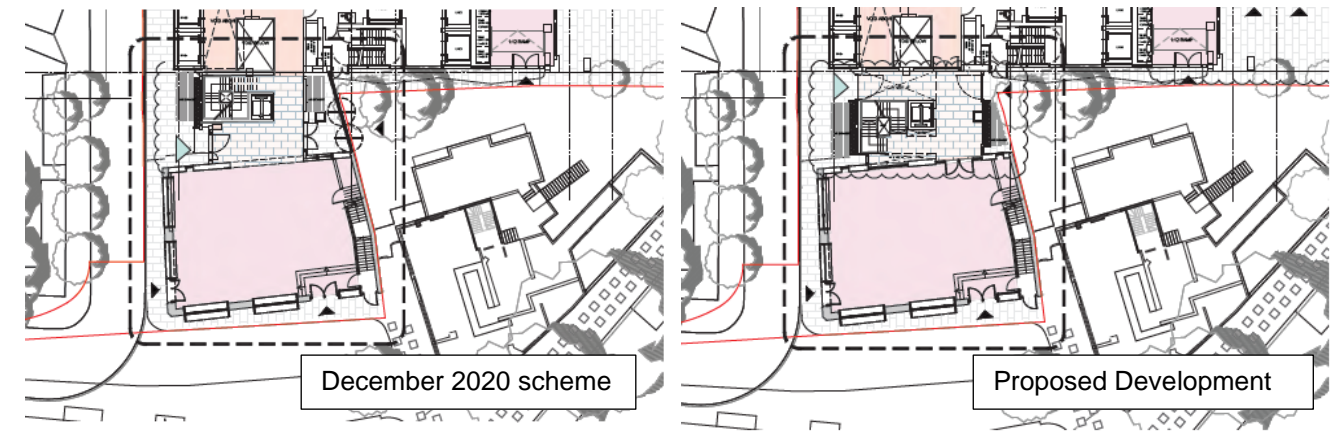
Additional Entrances to The Retail Hall On Ground Level (shown bubbled)
